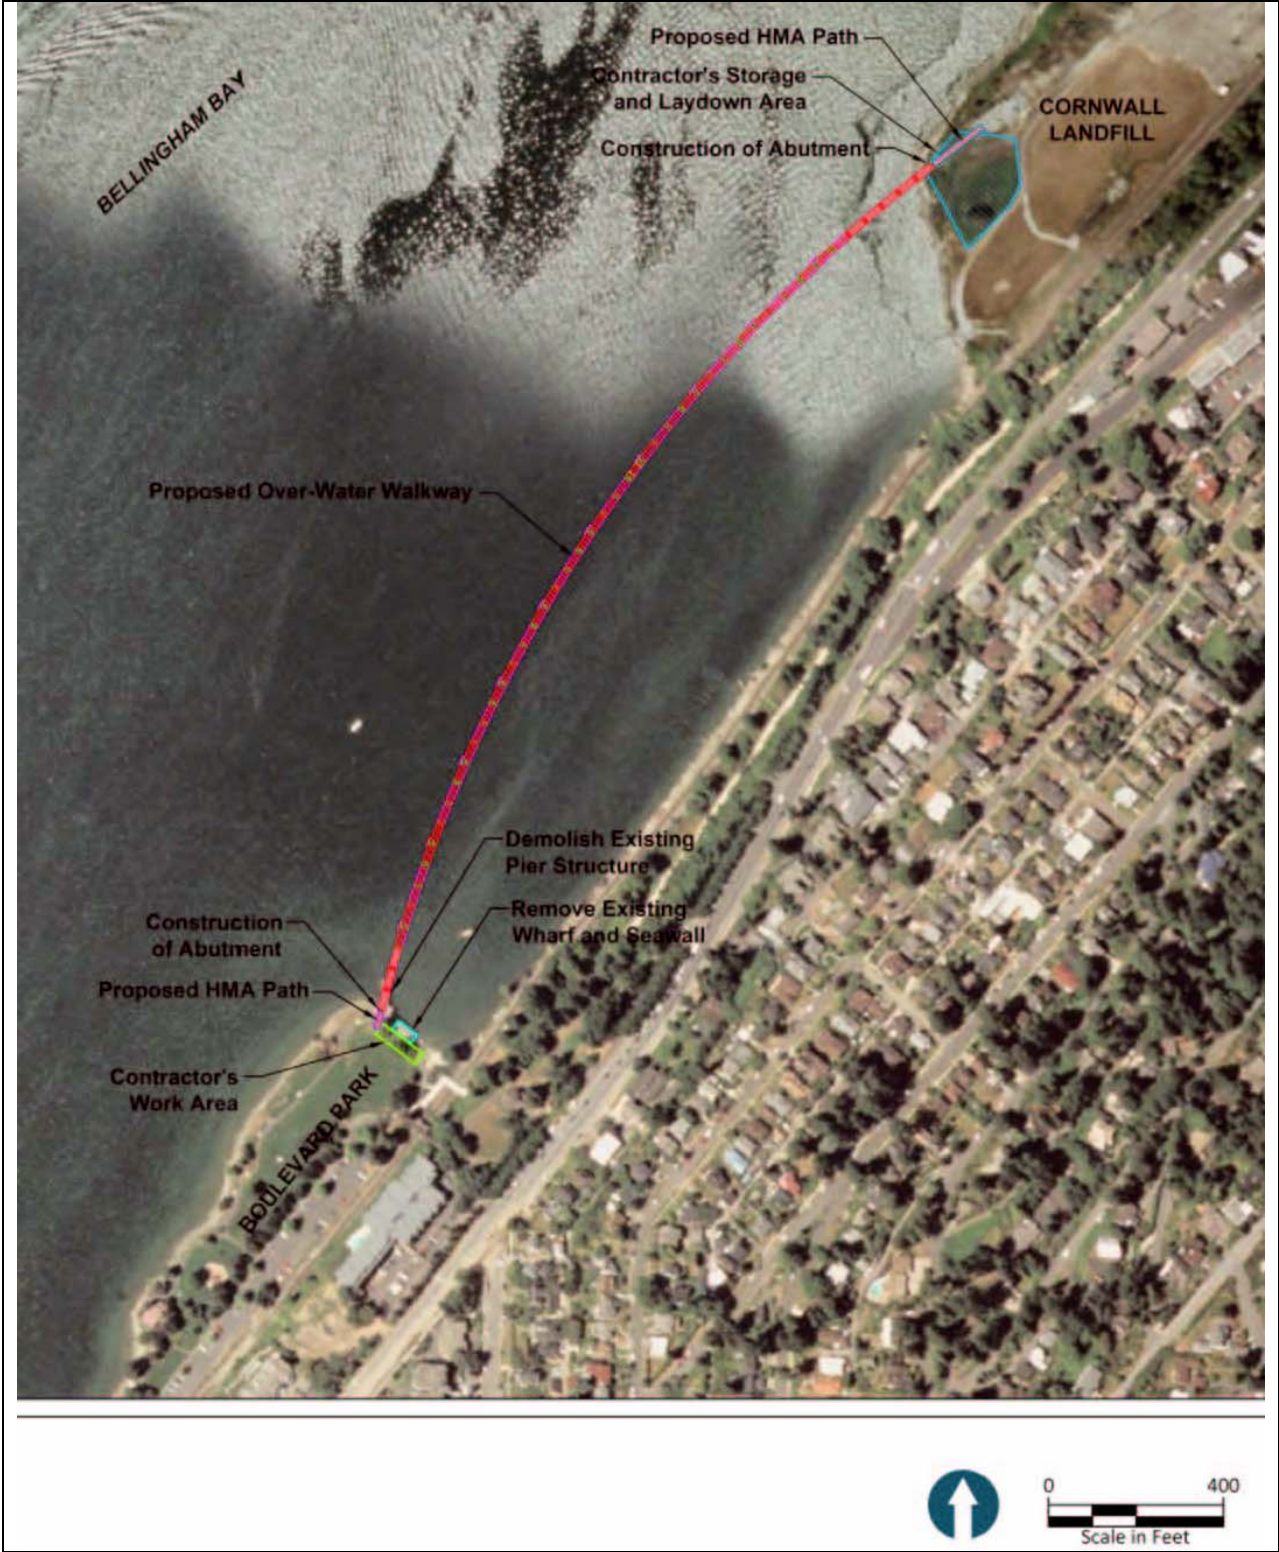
The Boulevard/Cornwall Overwater Pedestrian Walkway Project Area, Bellingham, Washington.
